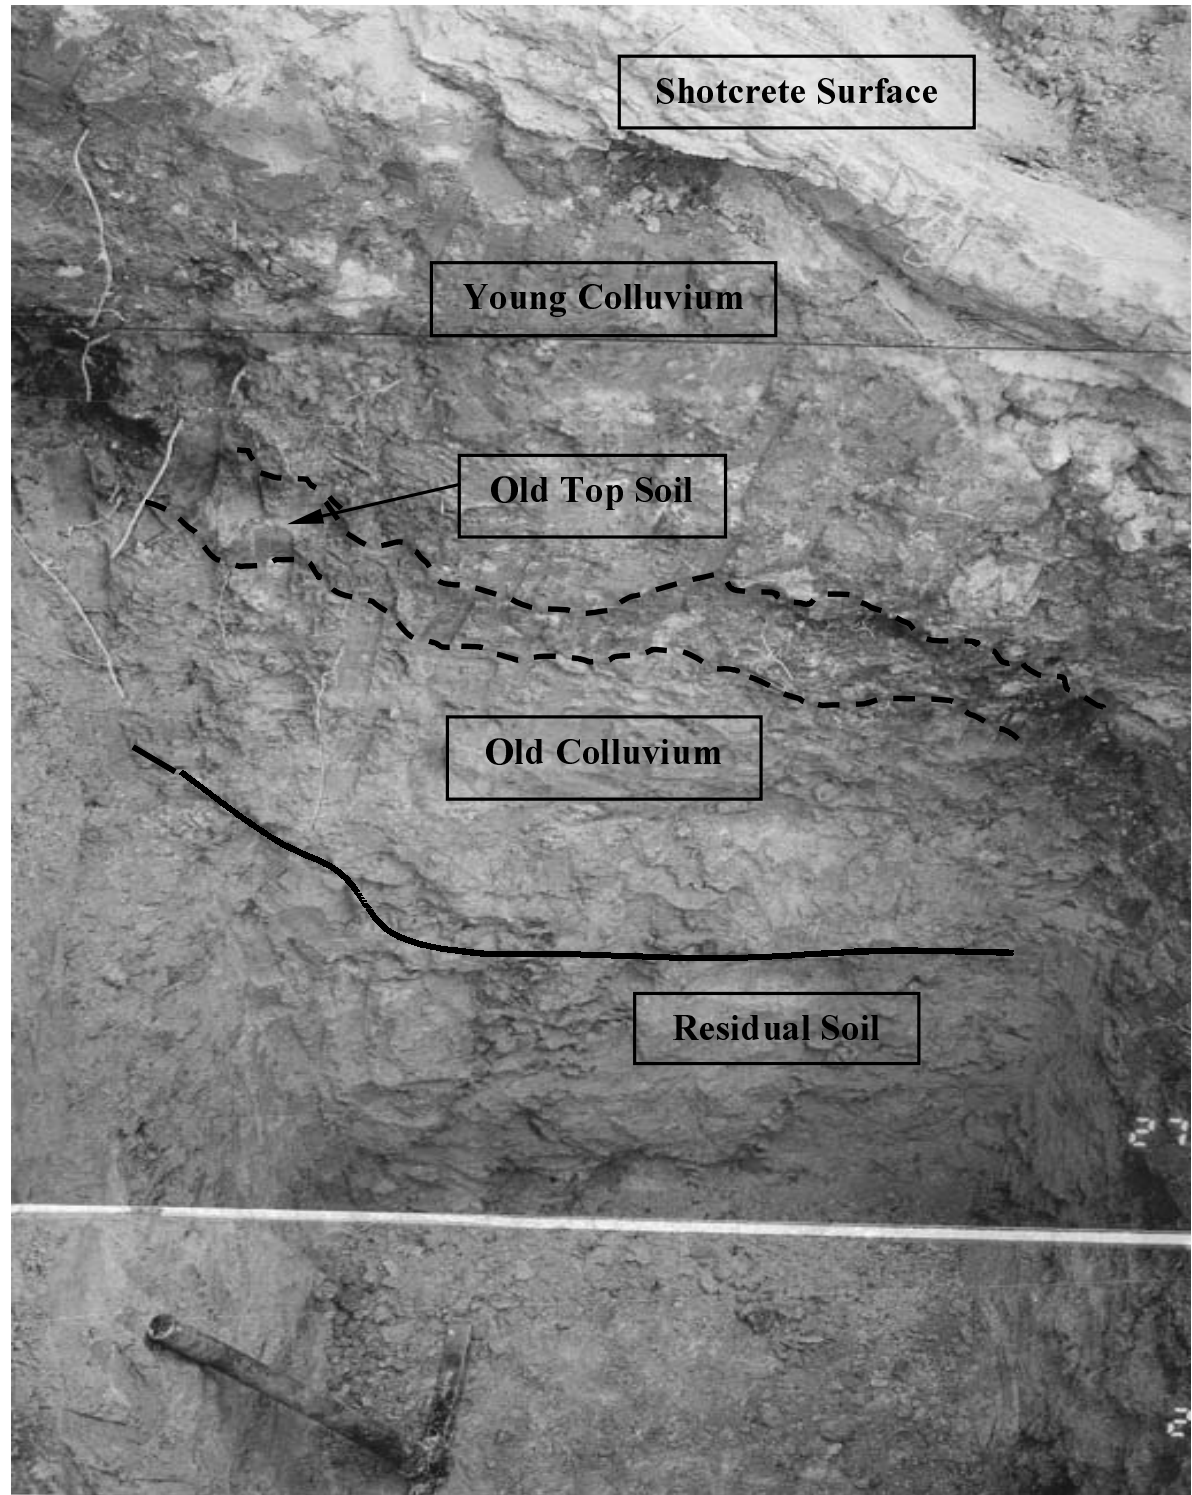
Subsoil Profile Exposed in Trial Pit TP1
